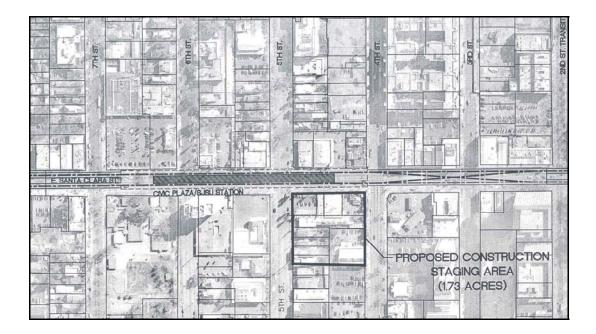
Construction Staging Site on Northwest Quadrant of Fifth and East Santa Clara Streets
